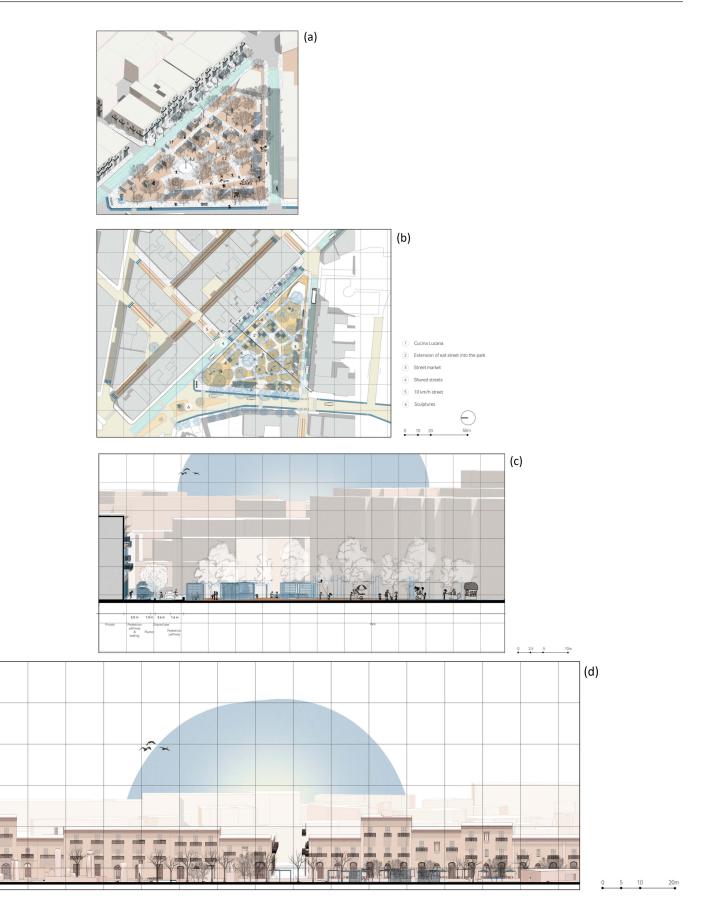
(a) Axonometric view; (b) plan; (c) section; (d) elevation of park and Cucina Lucana street.
